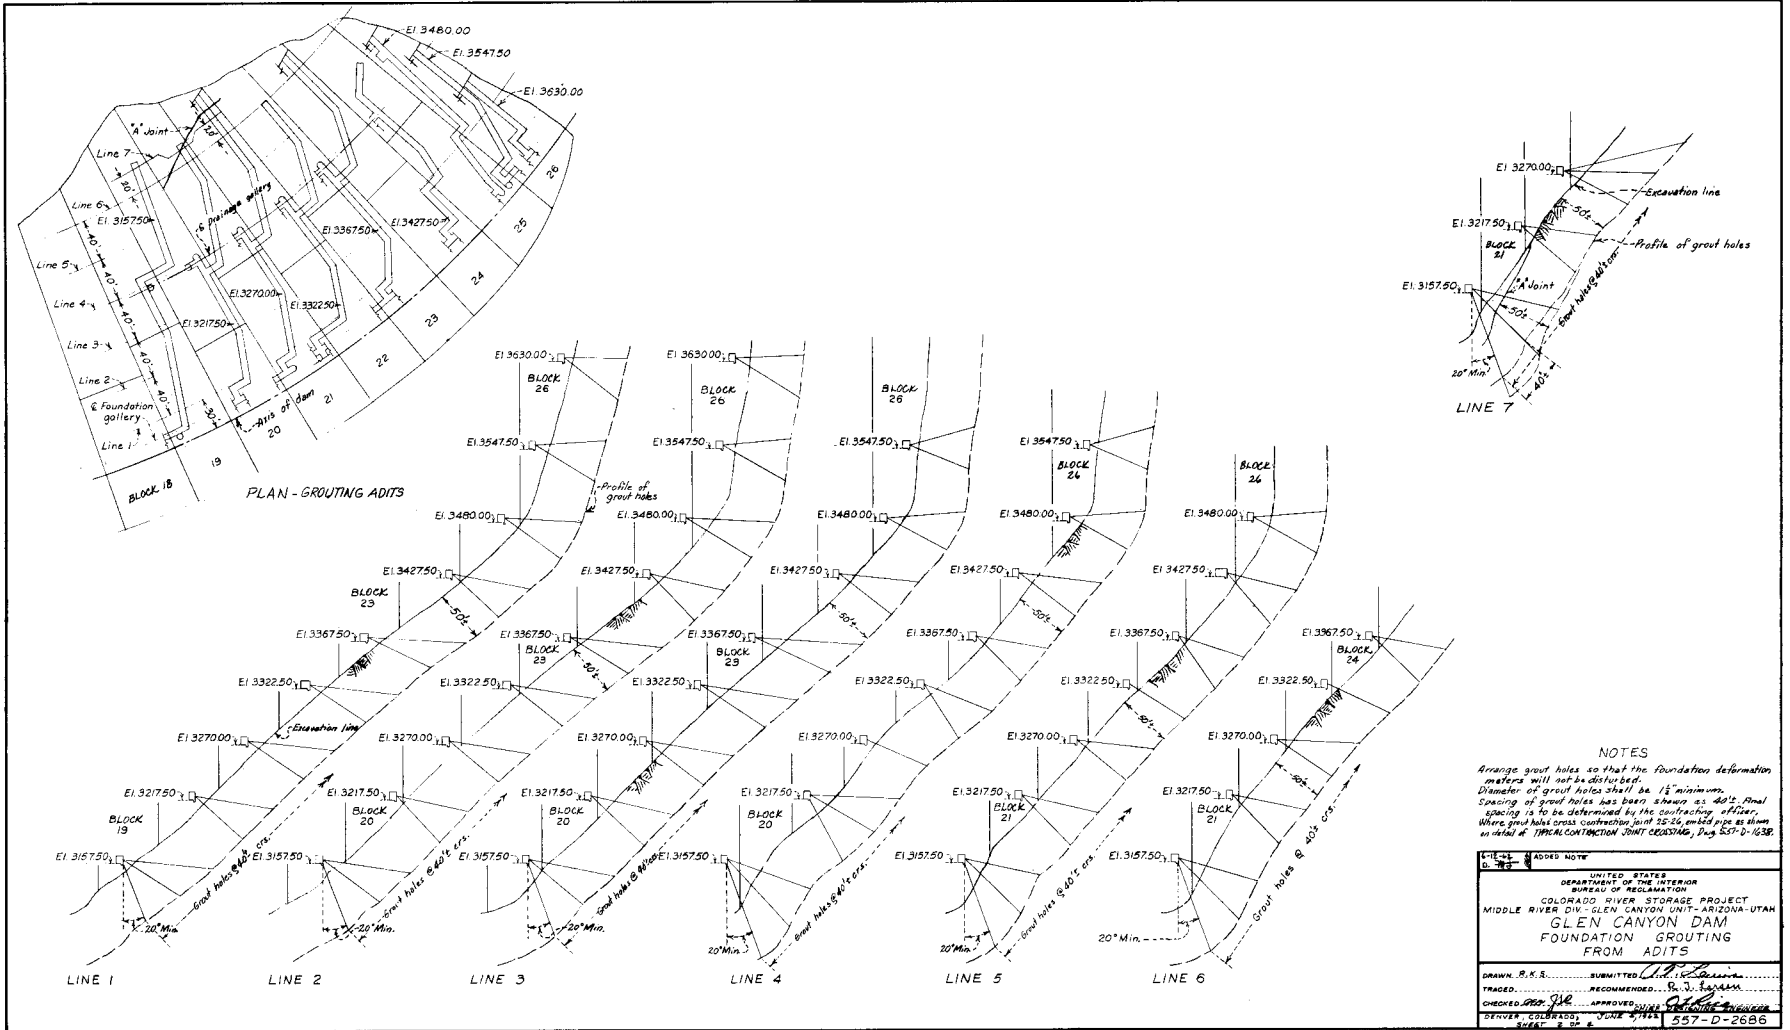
Dam foundation grouting from adits. (Sheet 2 of 2.)
